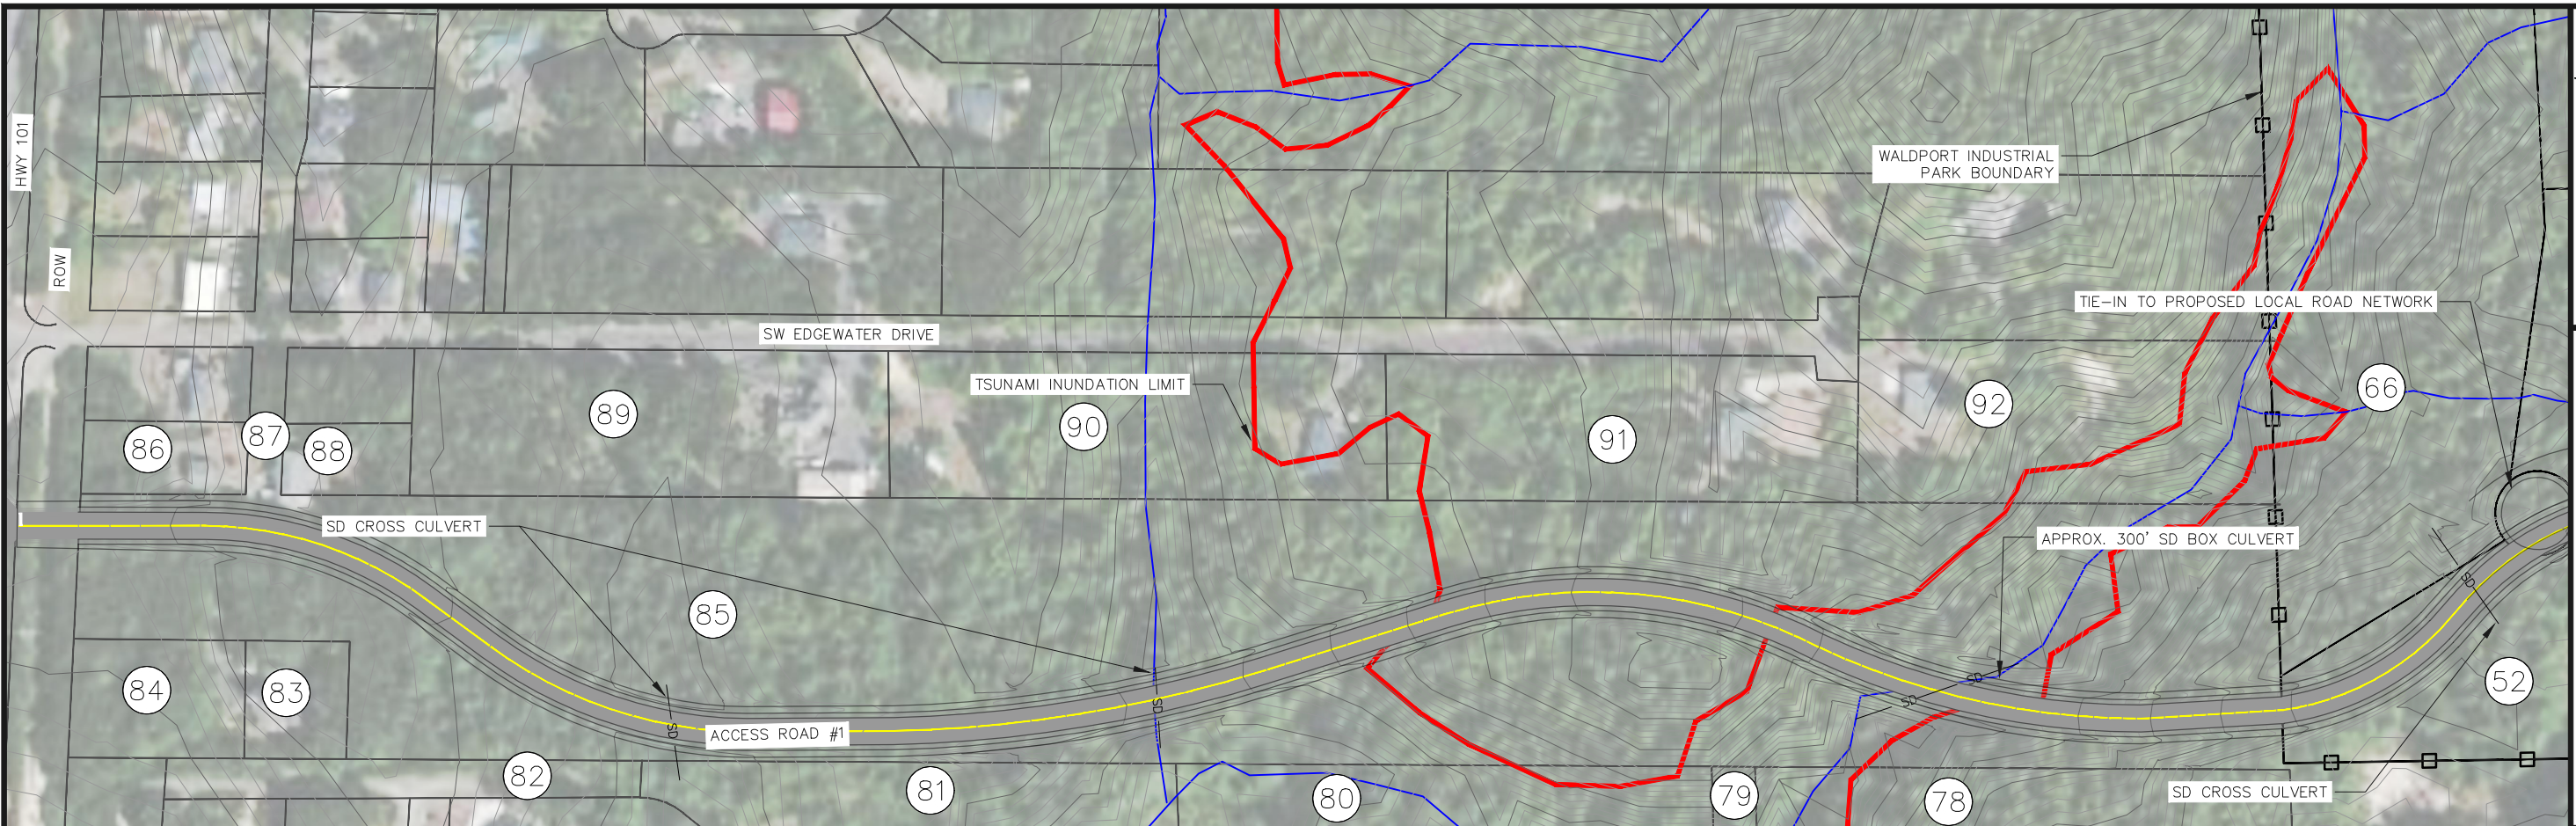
Plan View of Access Road #1 at Highway 101 Intersection
